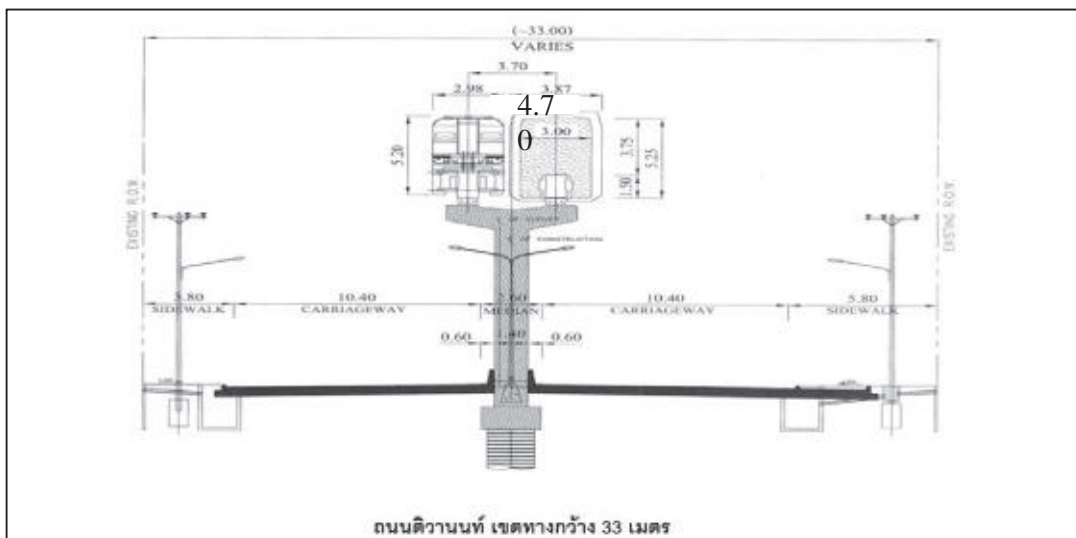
Traffic Condition after Completion of Construction on Tiwanon Road
